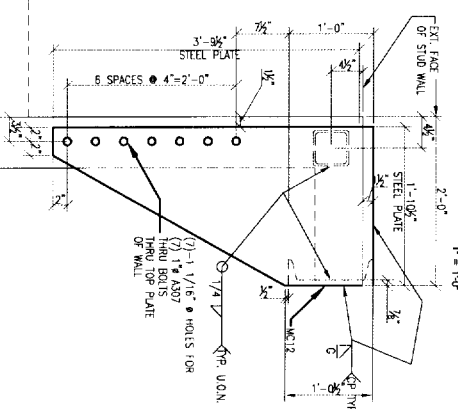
DETAIL @ TRUSS TO EXT. WALL CONNECTION S2.2
